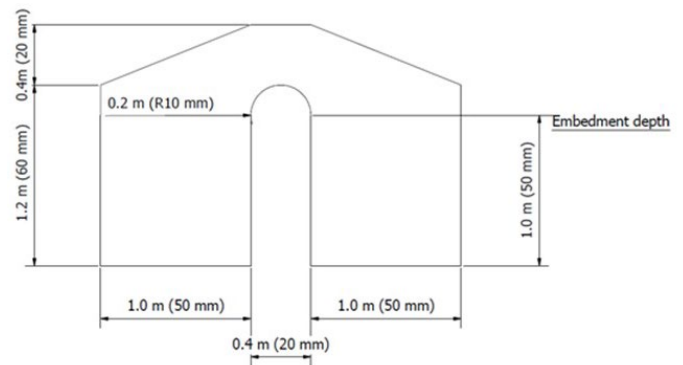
Test plate dimensions (showing centrifuge prototype scale and model scale in brackets)
